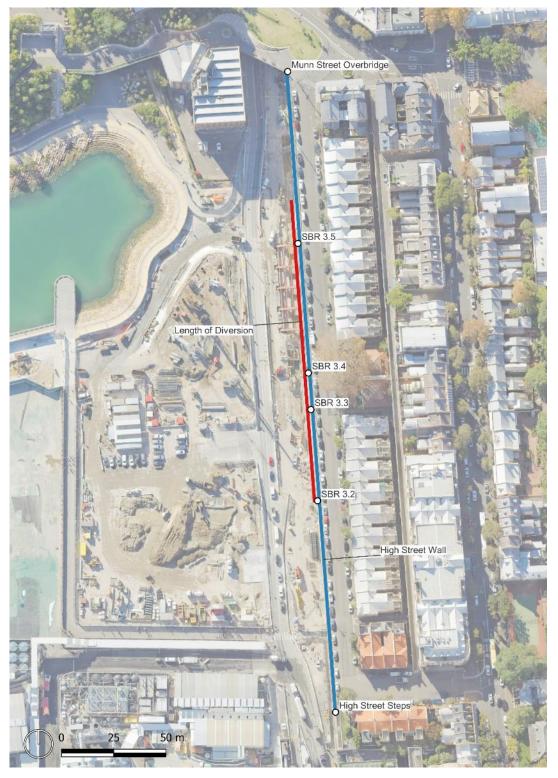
Location of the High Street wall, downpipes (SBR) and length of the diversion.
